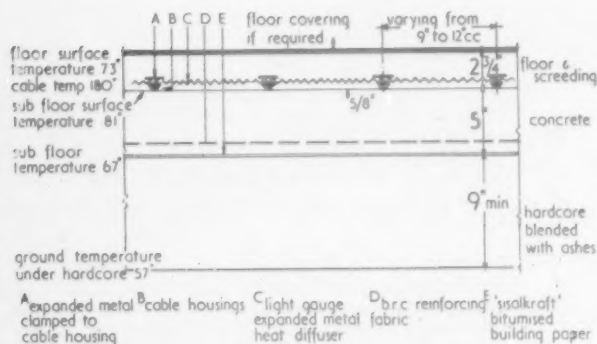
Typical section through floor with Panelec embedded low temperature electric floor heating.
